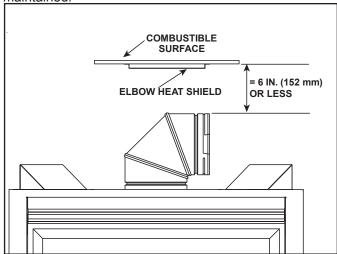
Conditions Requiring Elbow Heat Shield Installation
